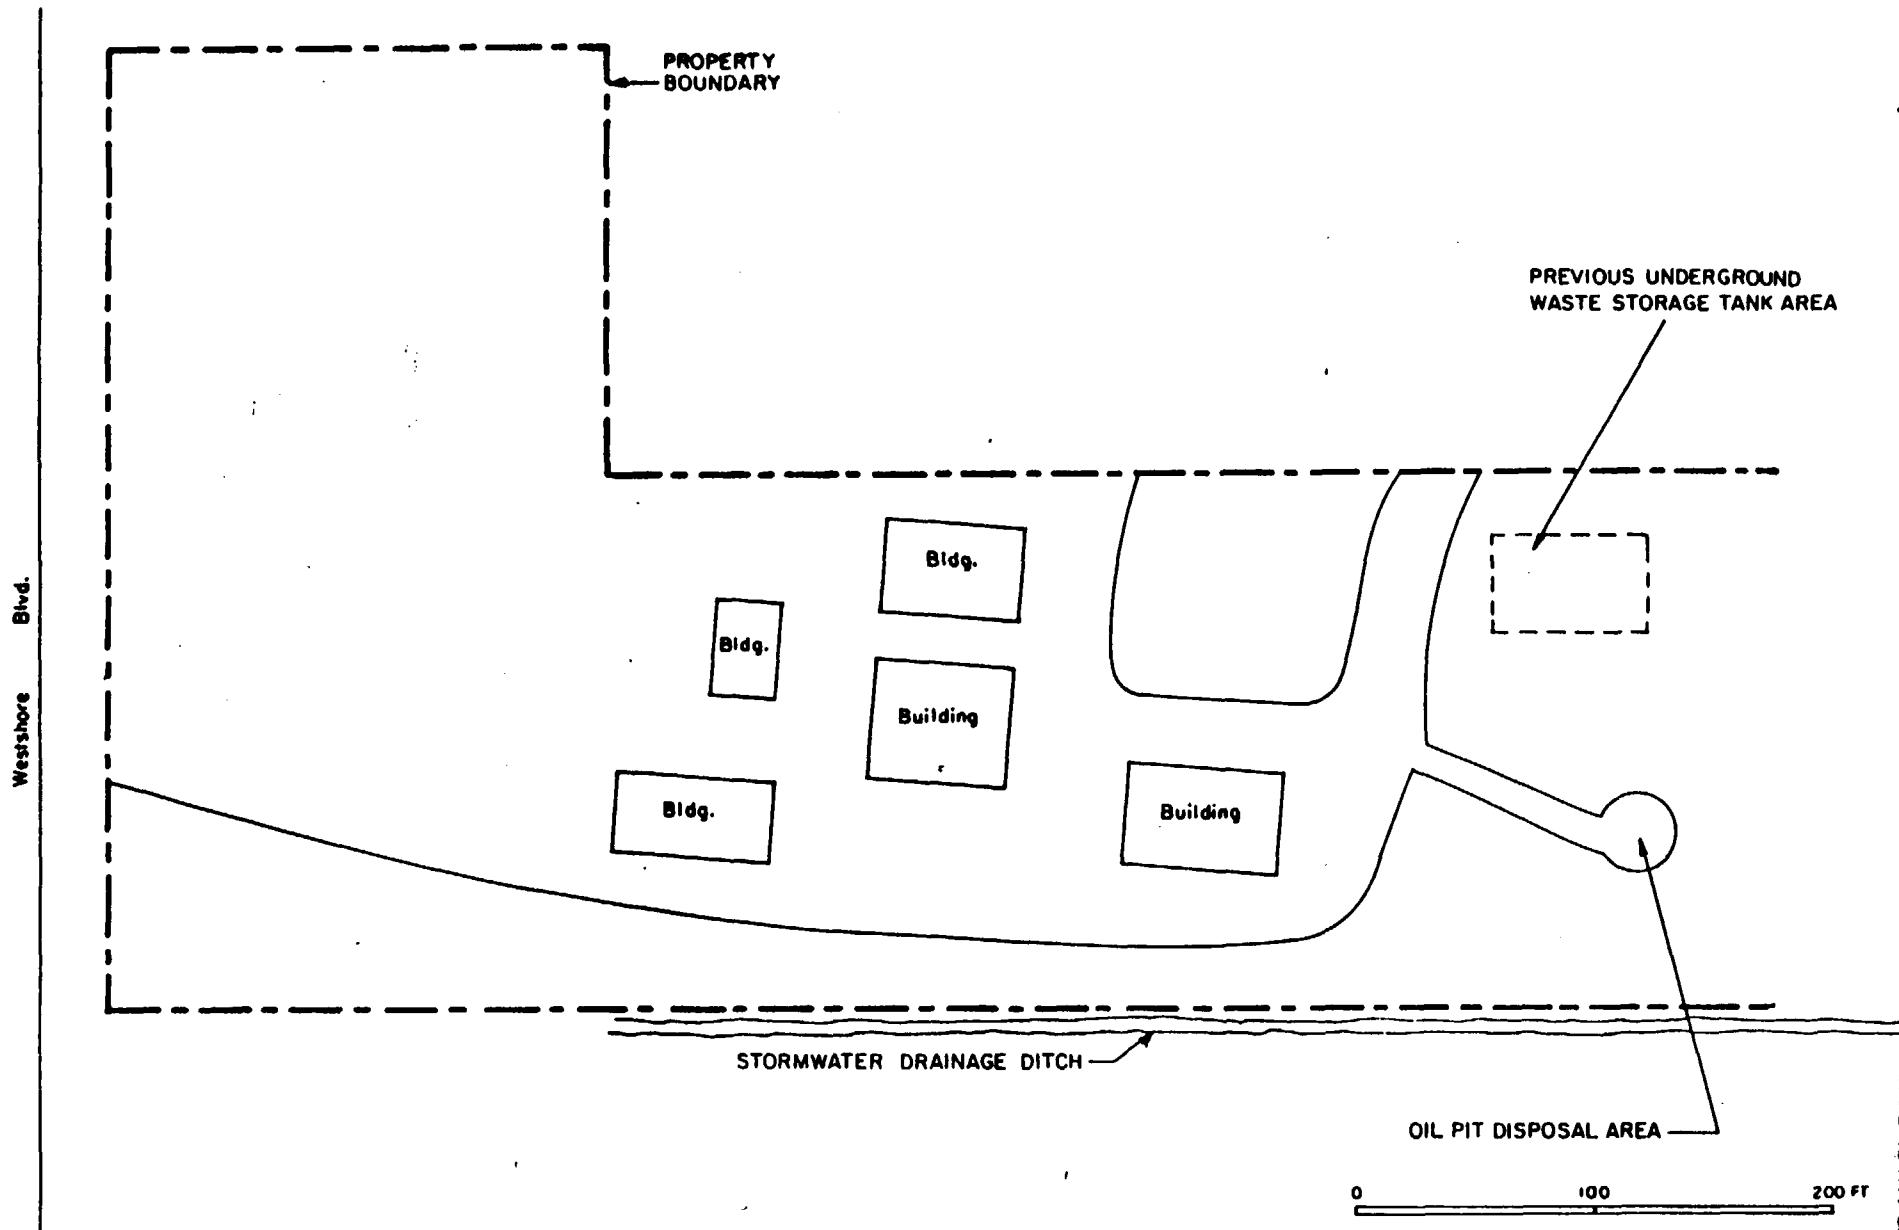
Site Plan of the Roto-Rooter Facility, Roto-Rooter Drain and Sewer Service Facility, Hillsborough County, Florida
